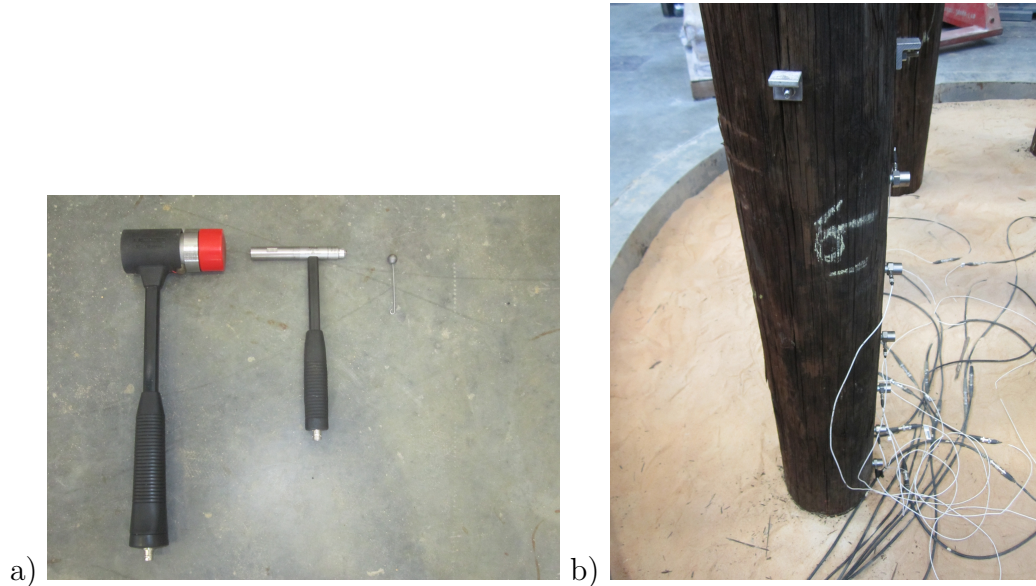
Guided stress wave testing: a) impactors used to strike poles during guided stress wave testing; b) photograph of guided wave test setup
